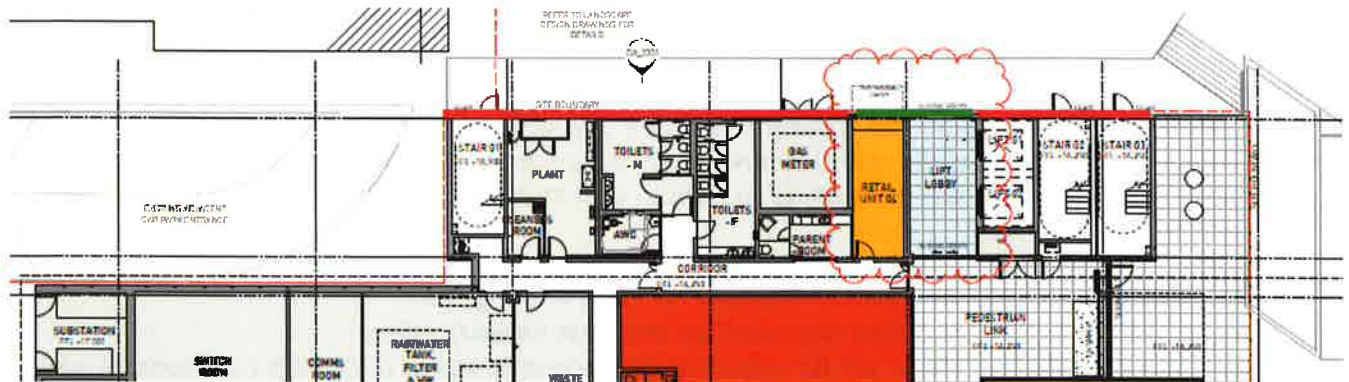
Proposed ground floor plan (with activated edges shown in green and inactive edges shown in red). Base Image Source: Applicant's RTS.
